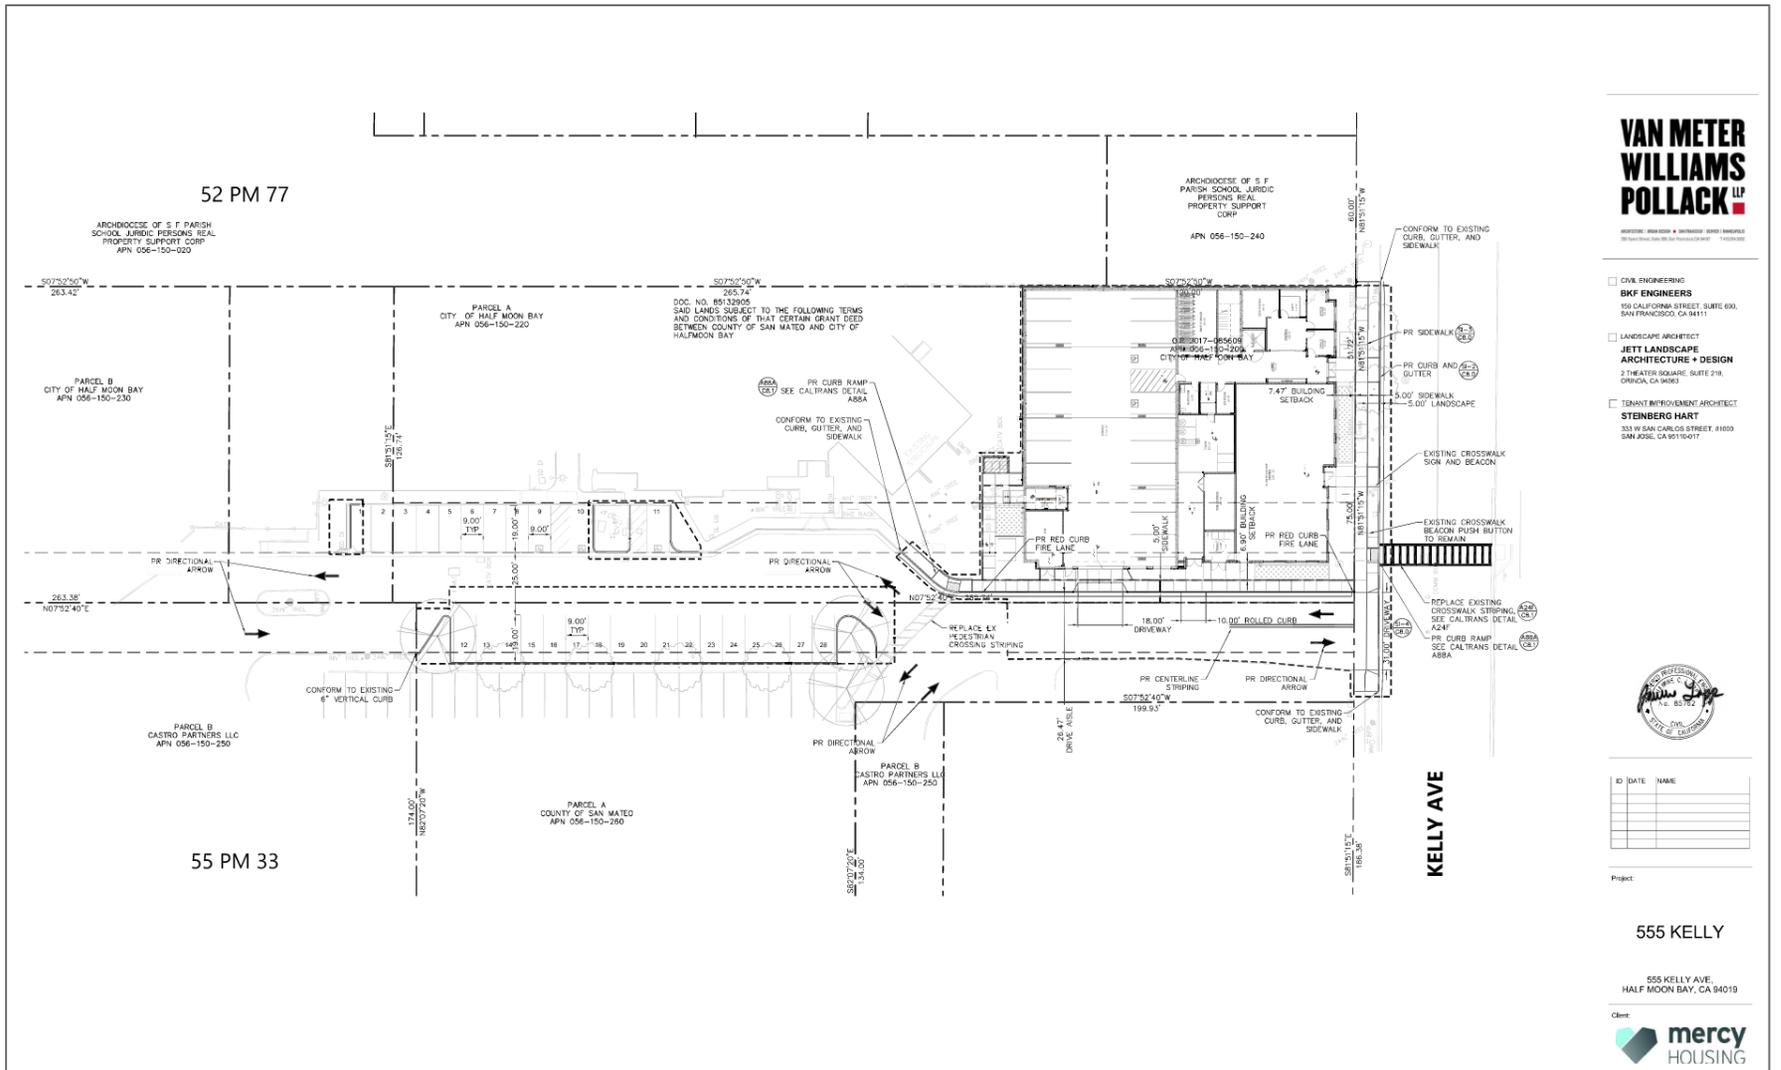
SITE PLAN AND PROPOSED PARKING LAYOUT
